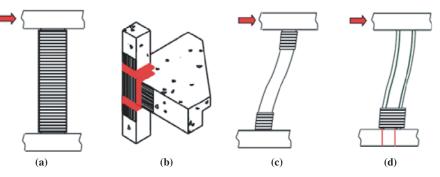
Seismic strengthening examples: (a) shear strengthening of RC column, (b) strengthening of beam-column joint, (c) local confinement in flexural plastic hinge regions, and (d) local confinement at lap splices.
